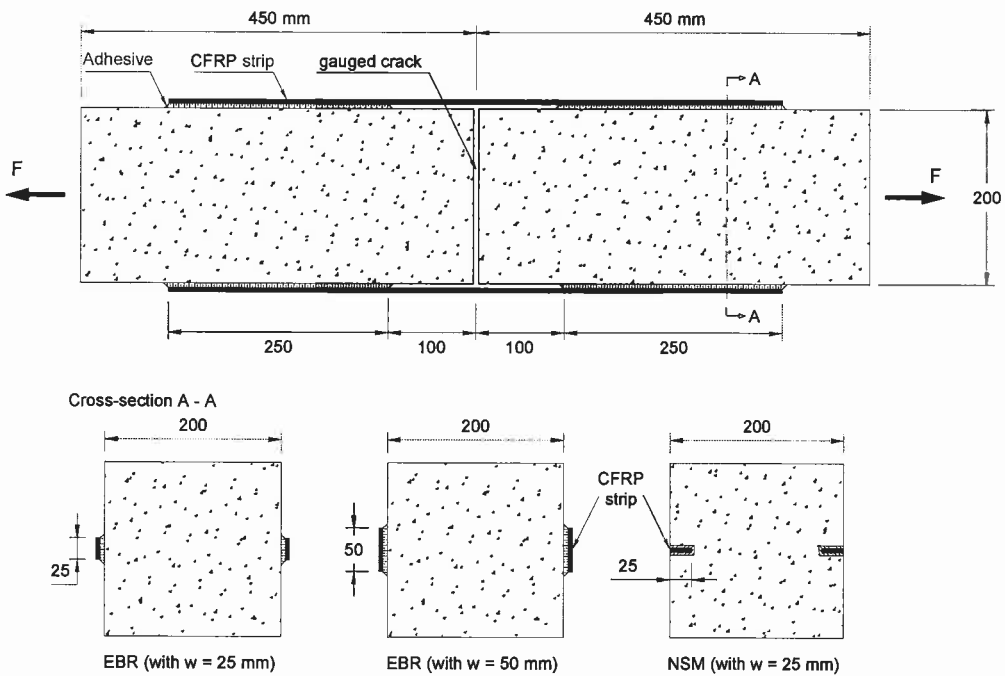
Geometry of the double-shear specimen for the bond tests carried out by BLASCHKO & ZILCH, 1999.
